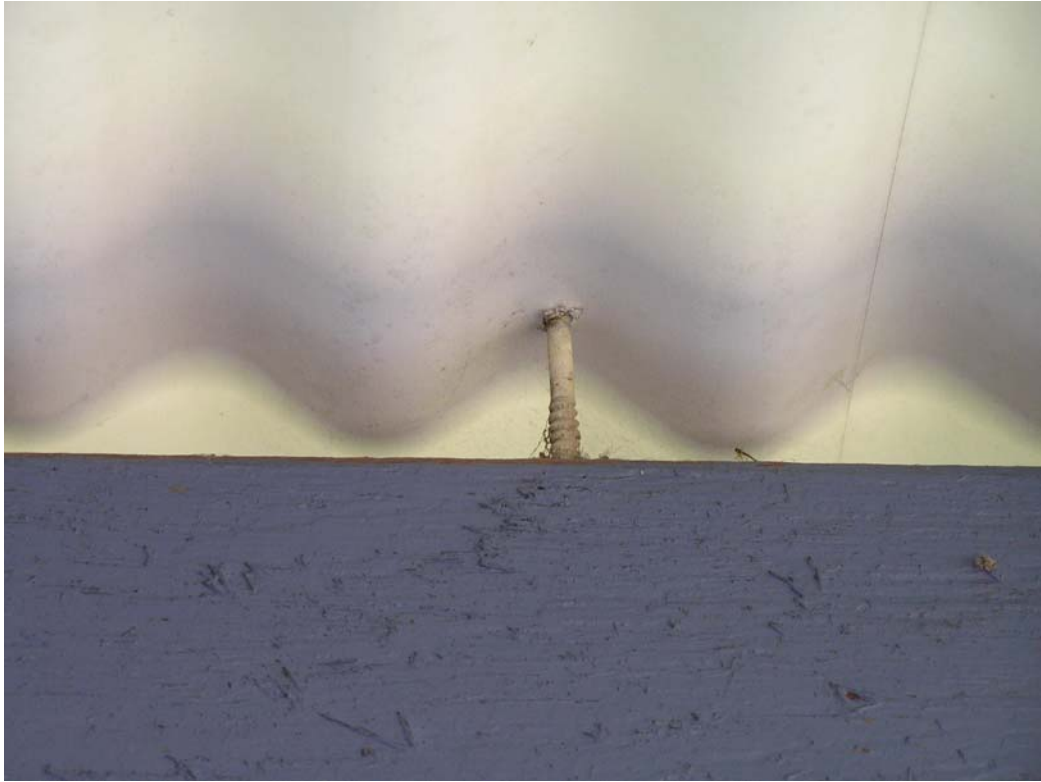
Shank of stainless steel fastener in Colorbond walkway, no deterioration.
